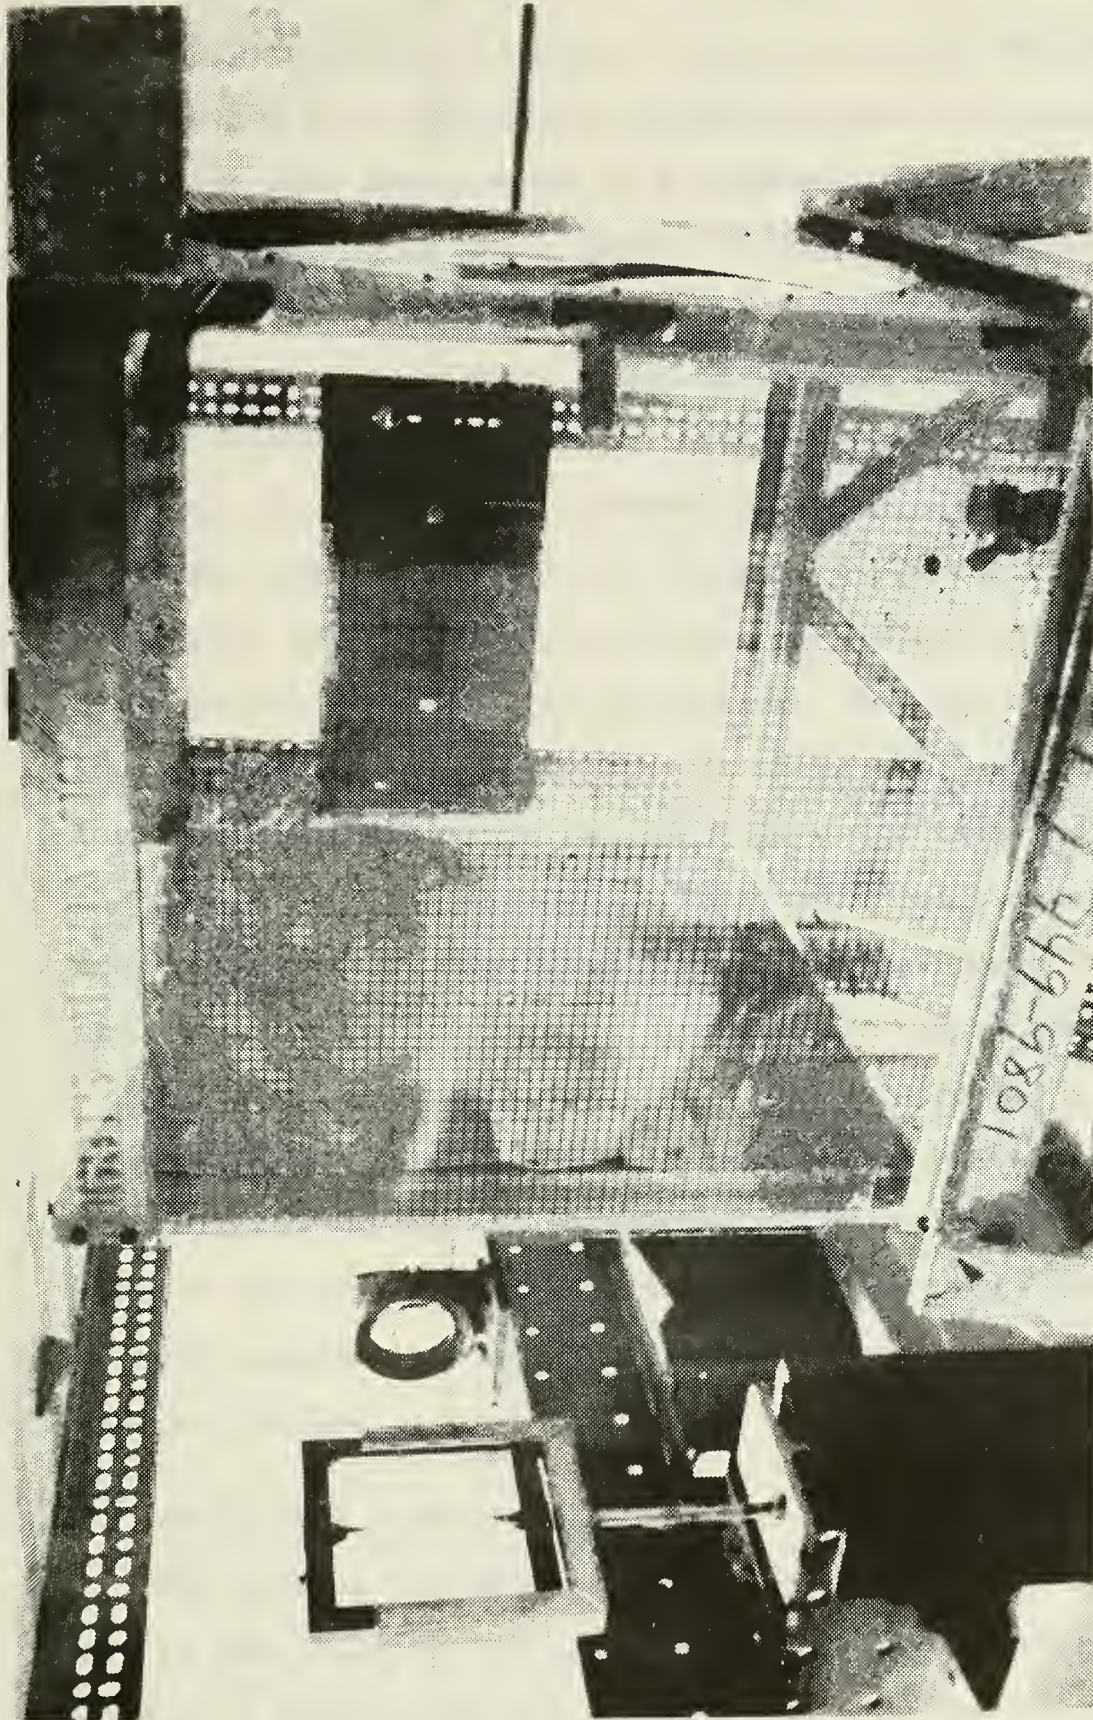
Damage to Solid Front Wall (Mounted on Tank)
